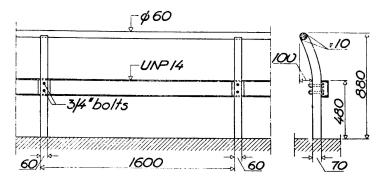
Warding-off parapet between roadway and cycle track on the new Liljeholmen bridge. Weight 62 kg/m.
